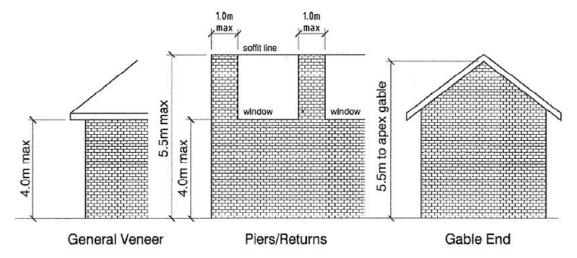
Maximum veneer heights for single storey, running-bonded construction – diagram sourced from Clay Brick & Paver Manufactures association
